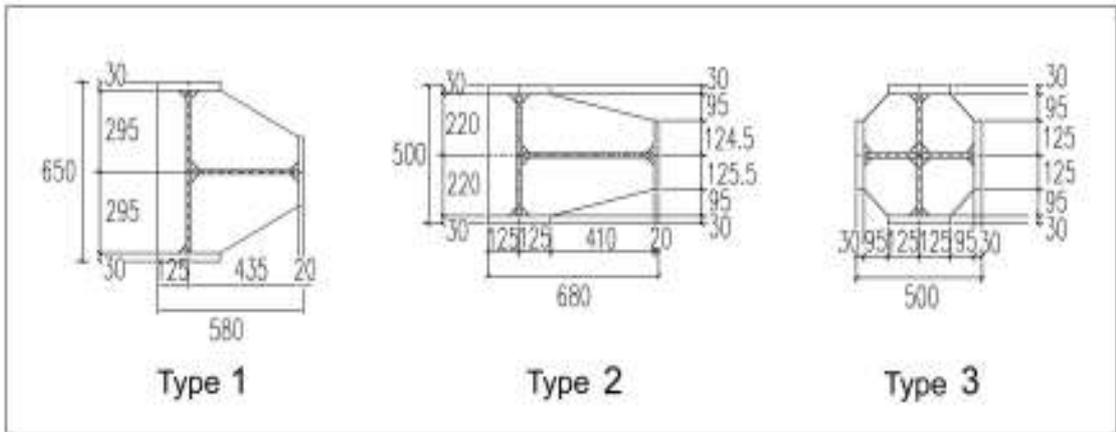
Three types of built up sections produced as columns for the TESKOMB Building
